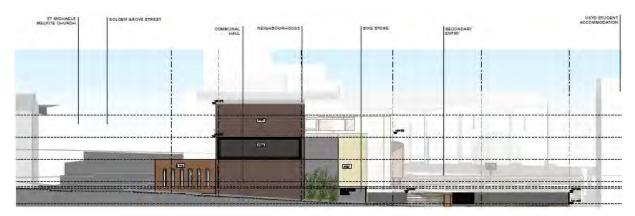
South elevation—Abercrombie Street elevation. (Source: FJMT, April 2020)
